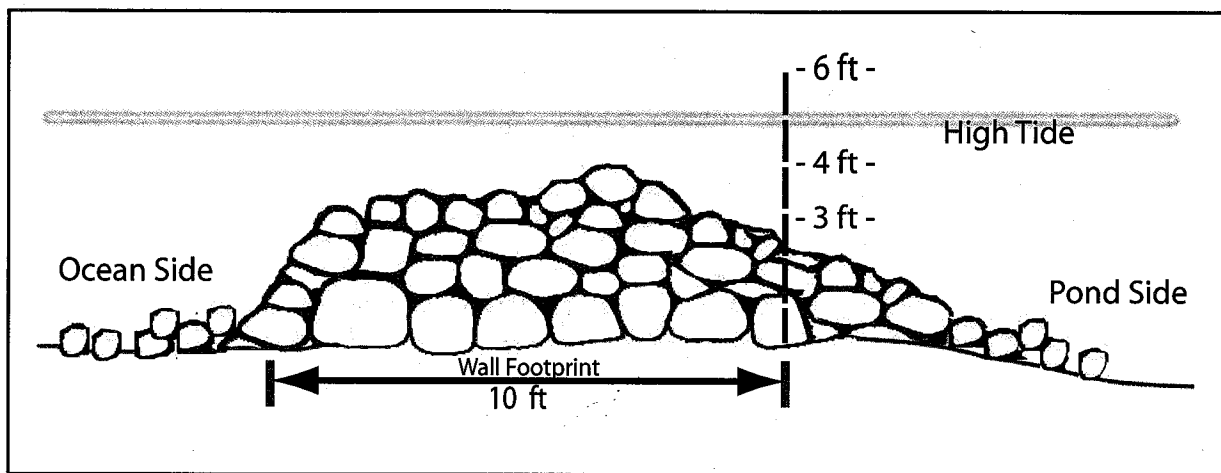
Kapoho Fishpond . Cross-section of Existing Wall.
